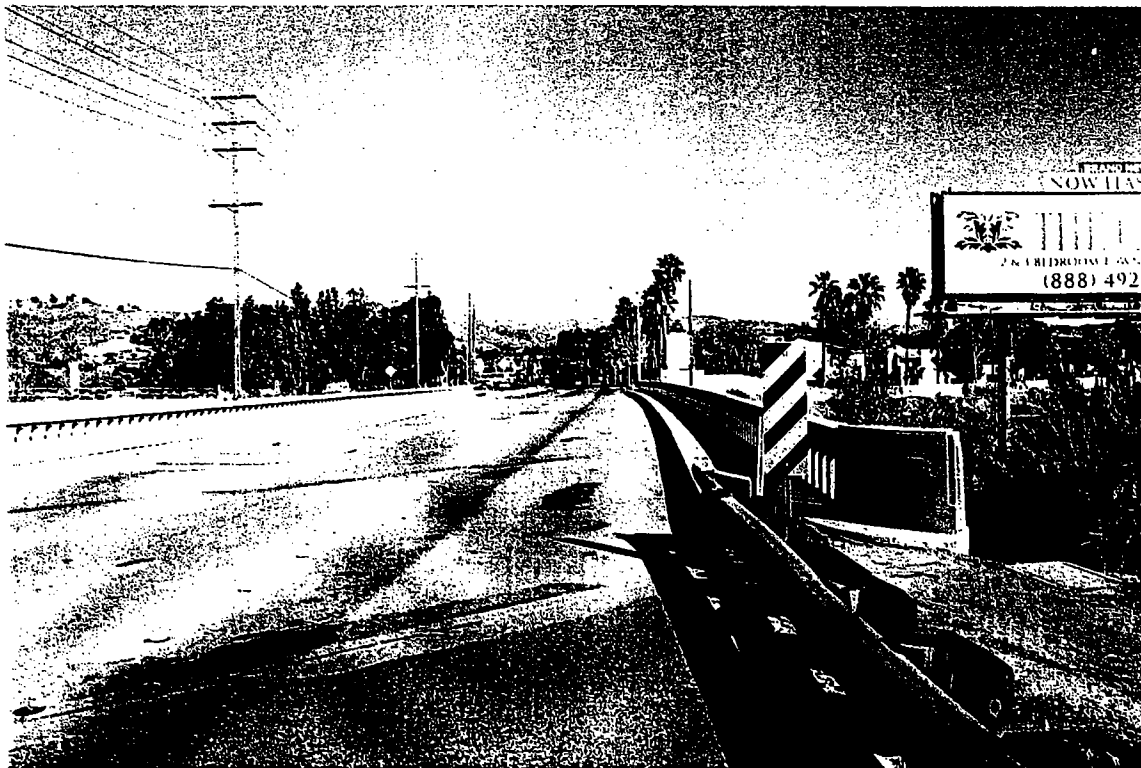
(Bottom): Looking north across deck of northbound Sierra Highway bridge.
